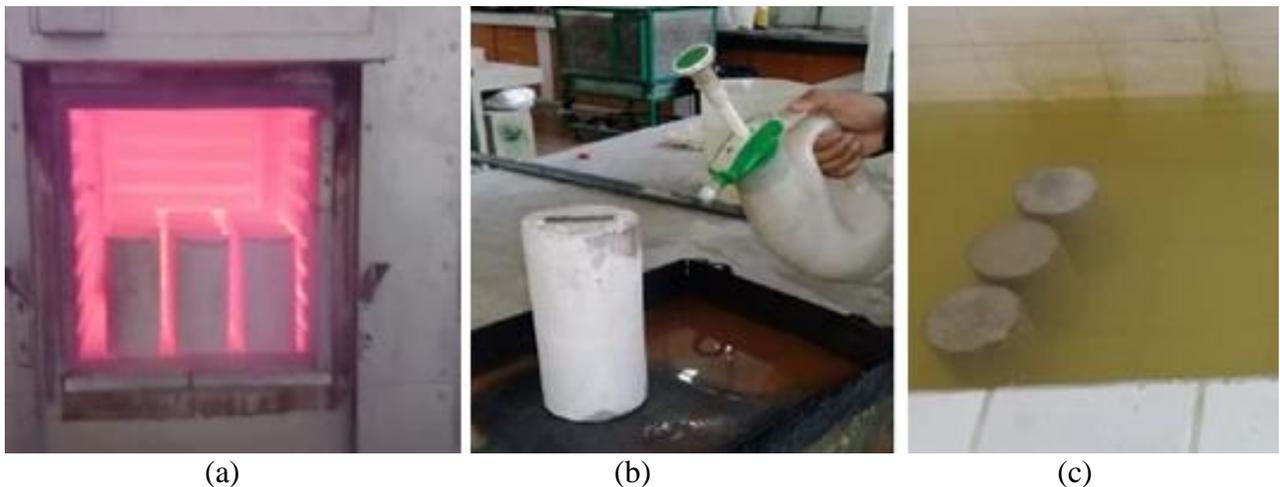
(a) concrete samples in a muffle furnace, (b) slow cooling with pulverised concrete, (c) sudden cooling in a container of water. Authors (2023).
